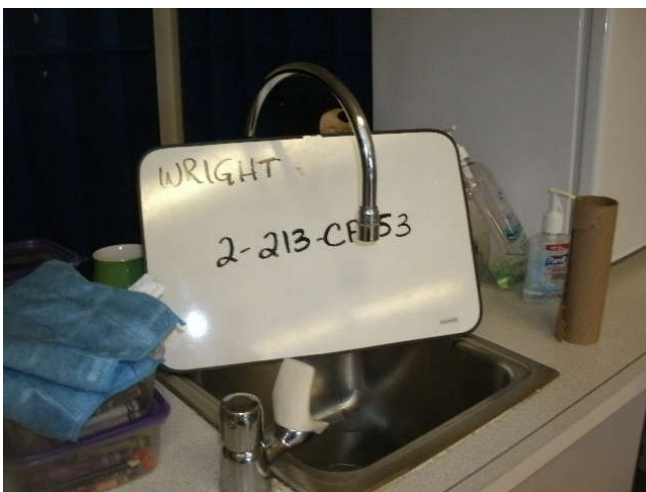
Classroom faucet w/bubbler, located on the 2nd floor, in room 213.
